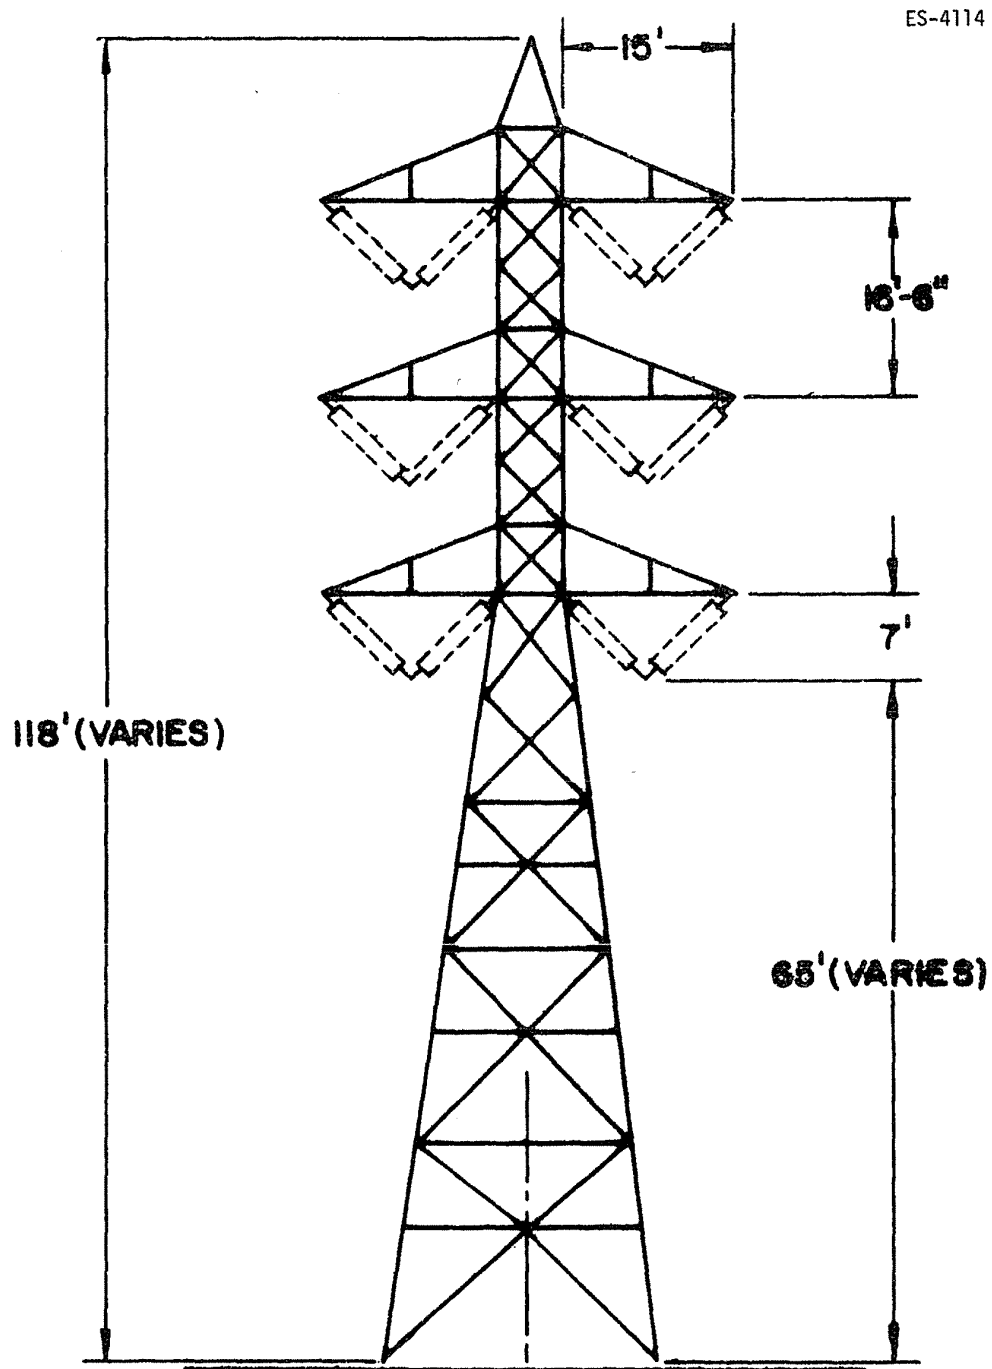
Typical steel lattice tower design used by San Diego Gas and Electric Company.
